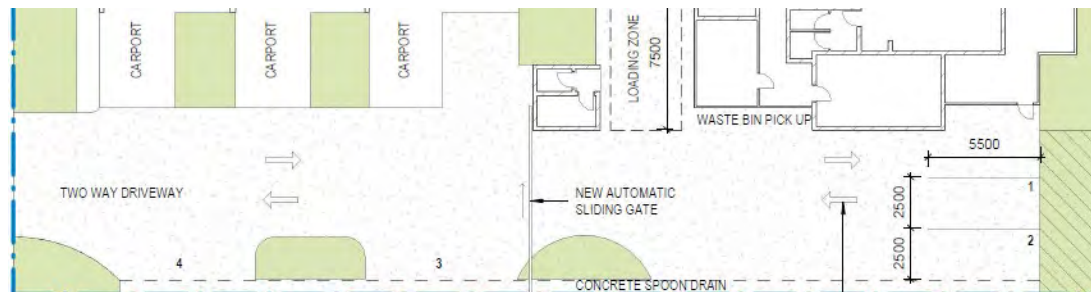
Reinstate two-way driveway - Proposed Site Plan, prepared by Funarchi, 25/03/2026
